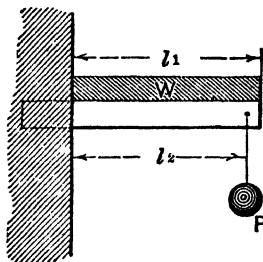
Cantilever Beam. Distributed Load and Load at Free End
